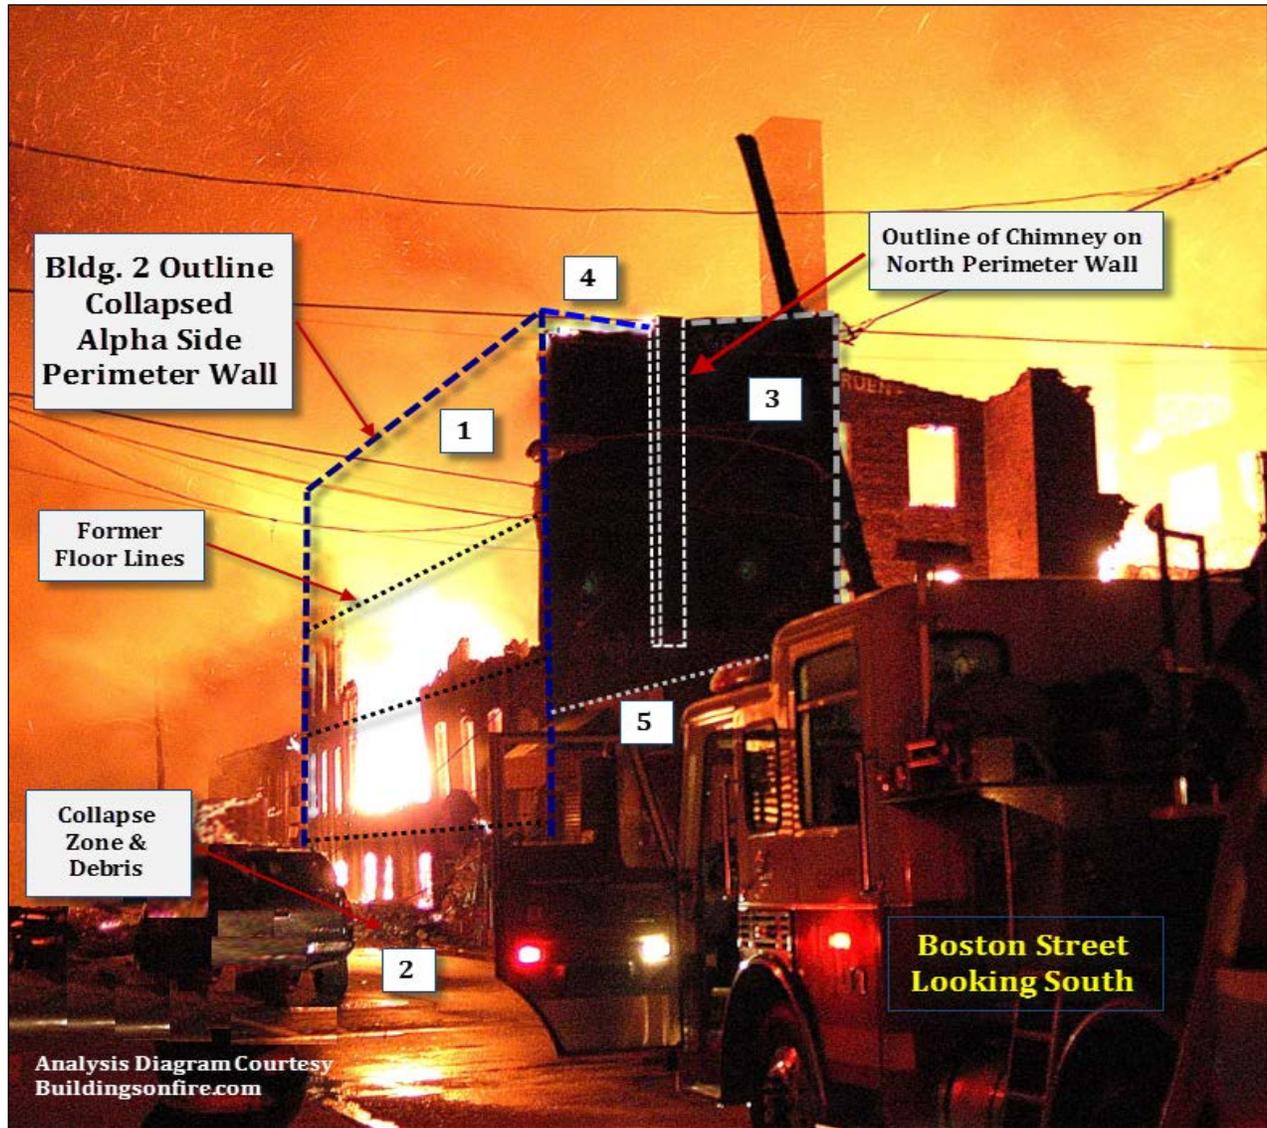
Collapse Assessment of Building 2, Alpha Side.
